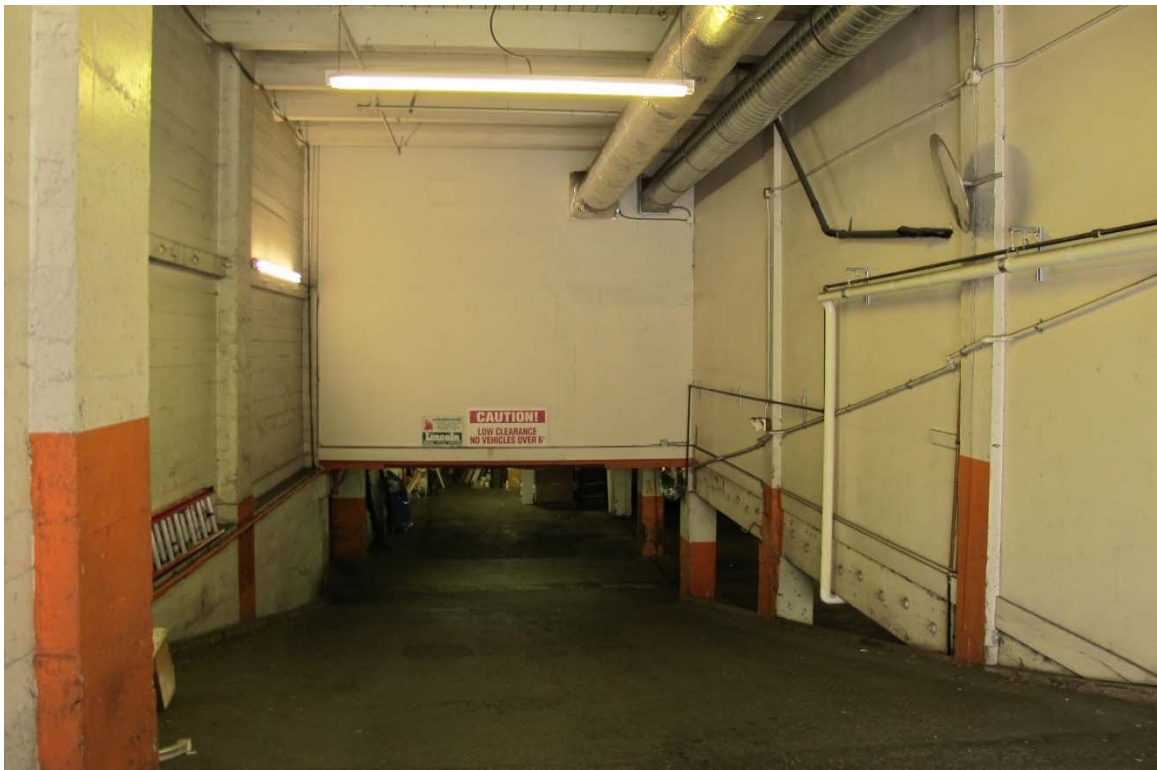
Interior, vehicle access to basement parking garage from Western Avenue.
